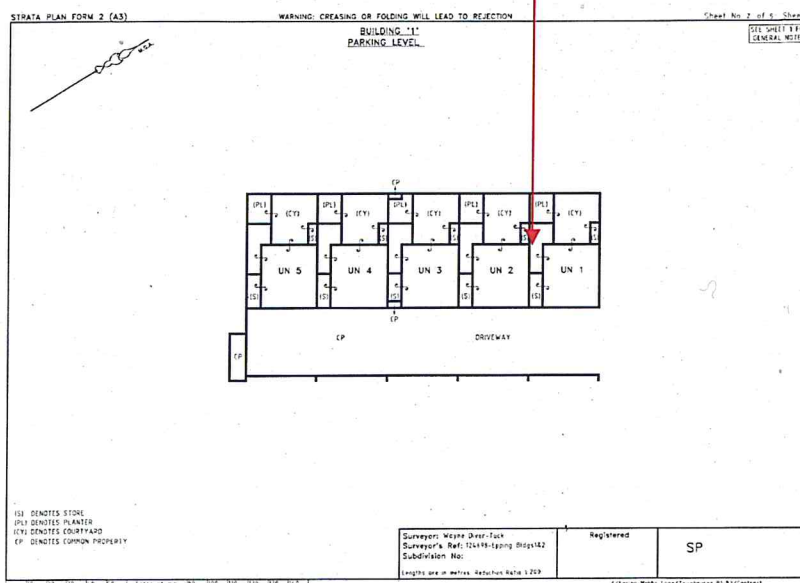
Building '1' Parking Level proposed strata subdivision plan.
